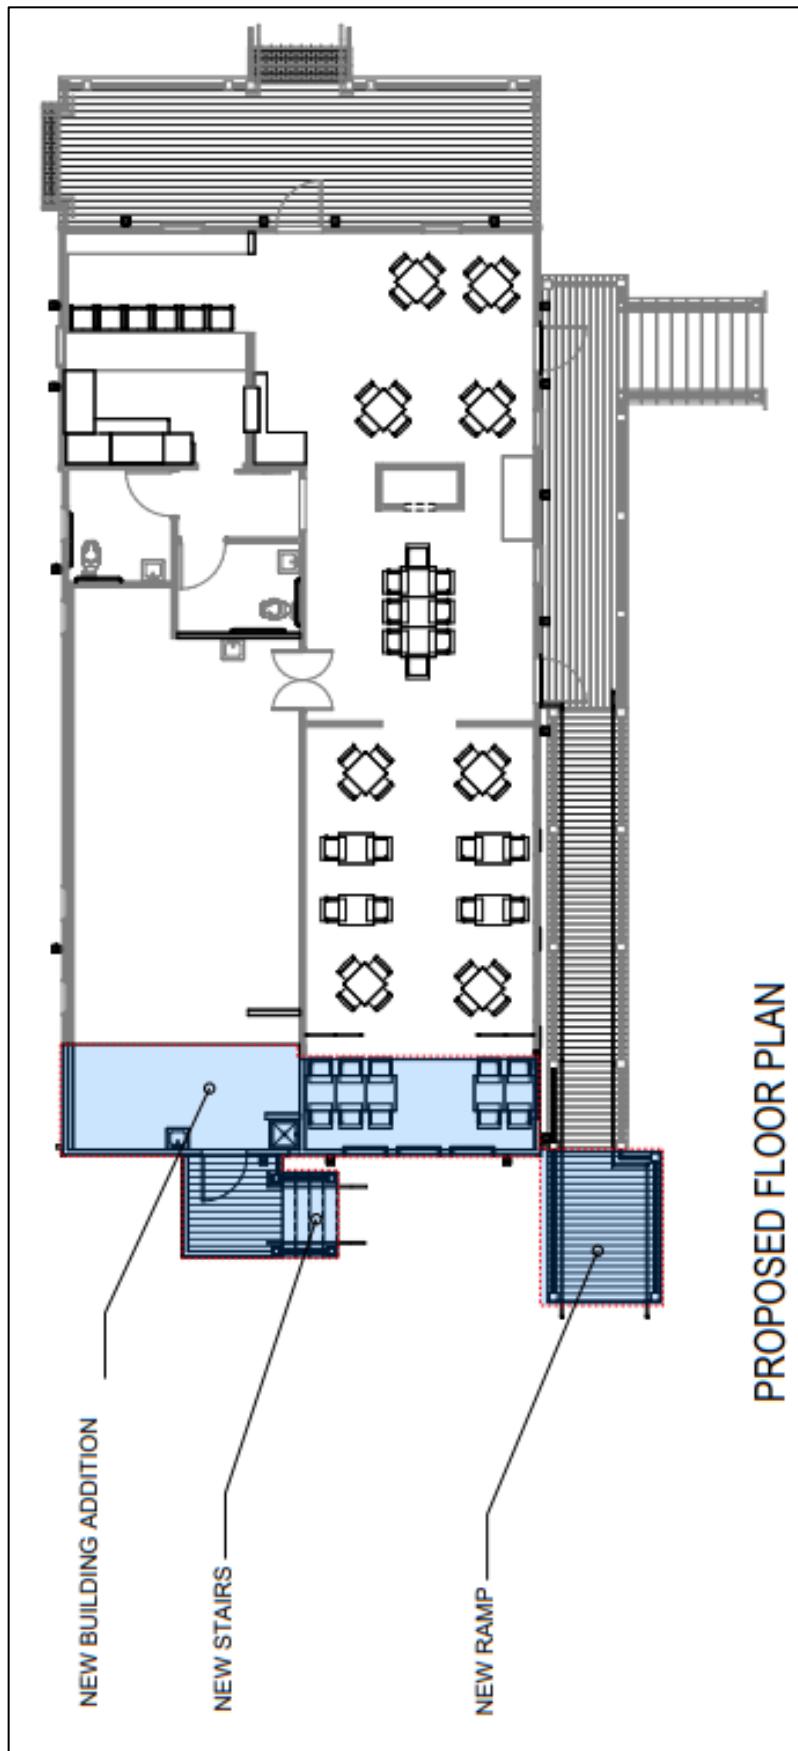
Internal floor plan, including proposed rear addition (provided by applicant)
